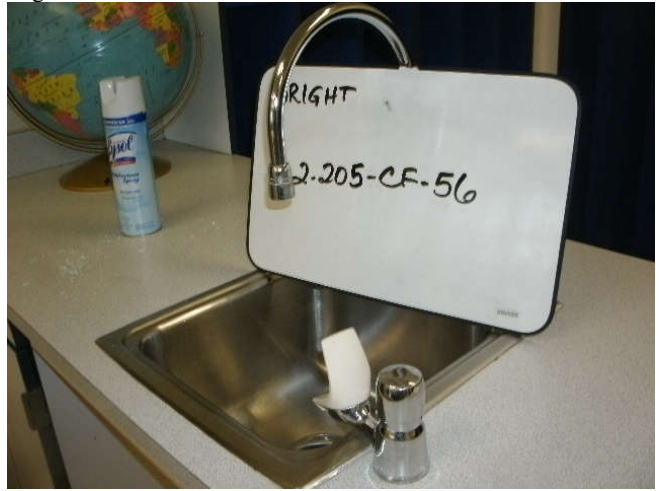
Classroom faucet w/bubbler, located on the 2nd floor, in room 205.
